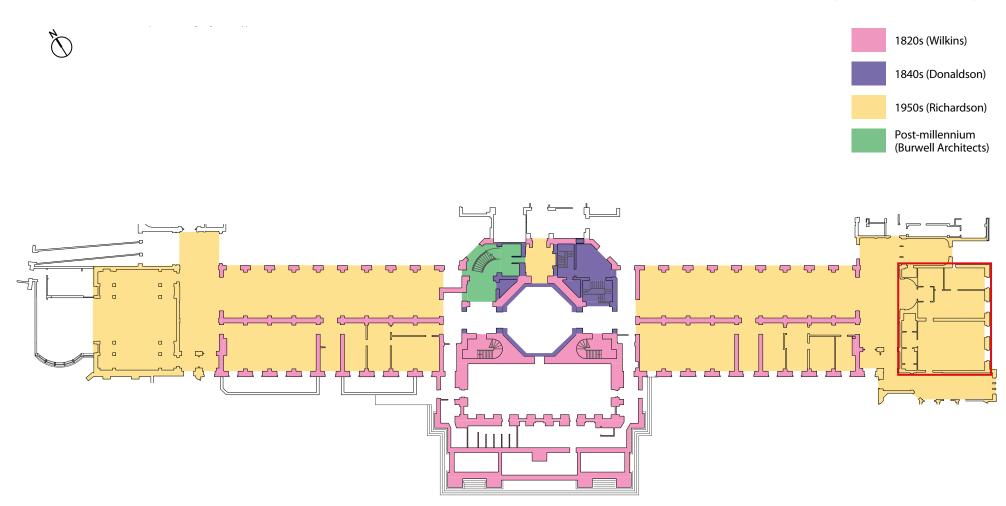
Ground floor age of fabric. The red box outlines the area covered by this Llisted building consent application
